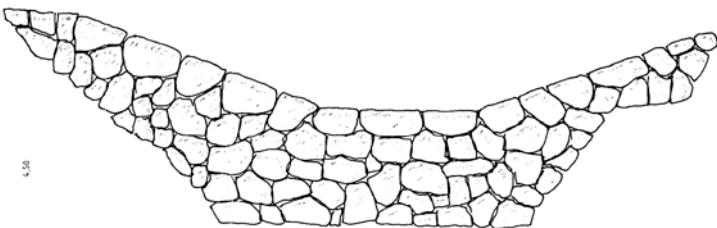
Example of a flexible check dam constructed boulders tightly connected by steel cables in the toe zone at the Gradenbach site (modified after Weidner 2000).
